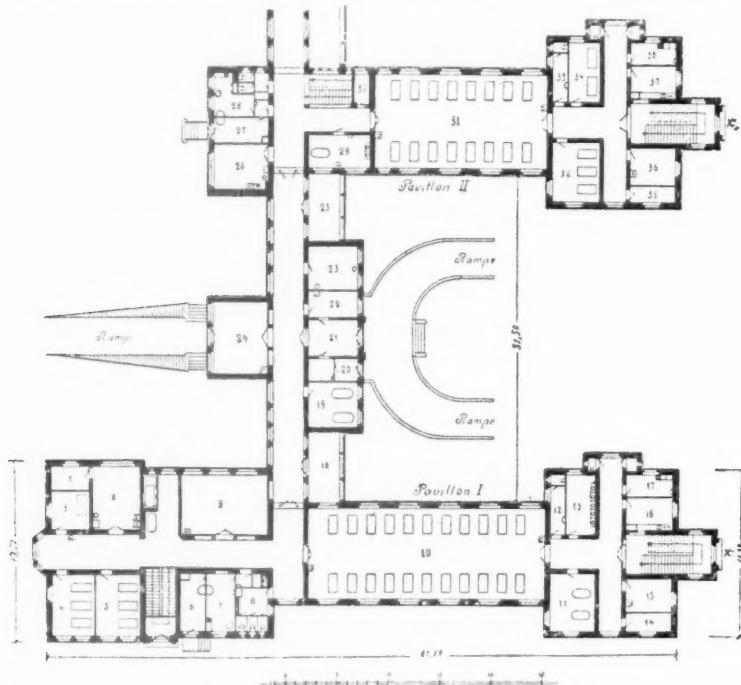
GROUND FLOOR PLAN OF PAVILIONS I. AND II. OF THE SURGICAL DEPARTMENT, CHARLOTTENBURG WEST END HOSPITAL.
